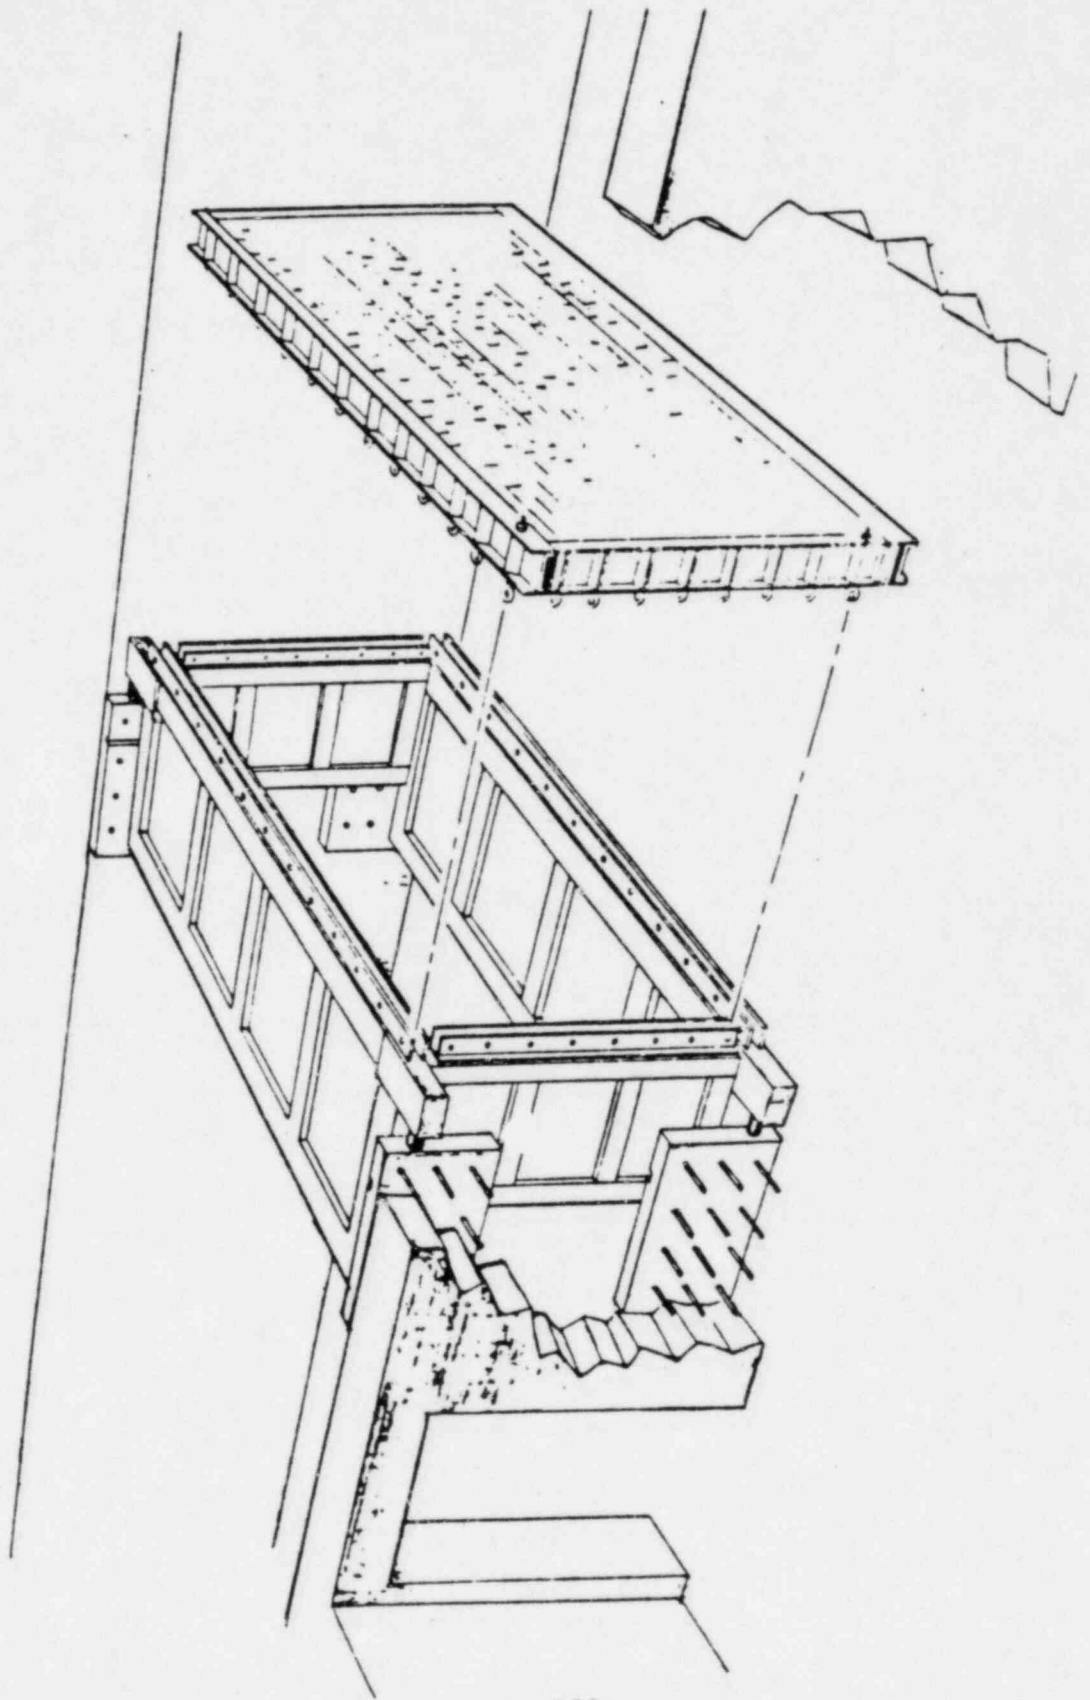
Cutaway view of shock tunnel showing test panel and simple plate support condition hardware.
